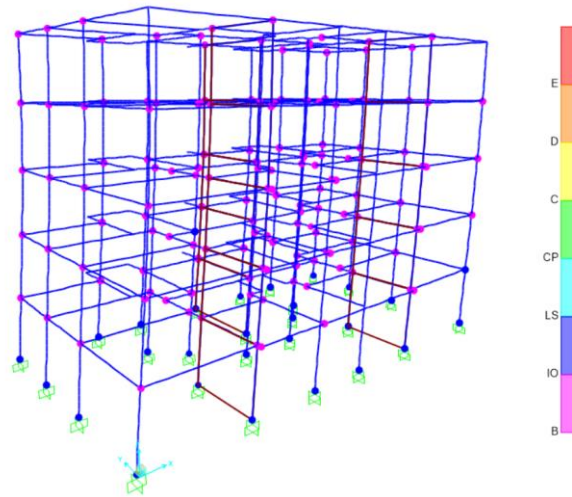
Hinges' state in step 14 in X direction (Normal shear wall – Shear wall-III)
